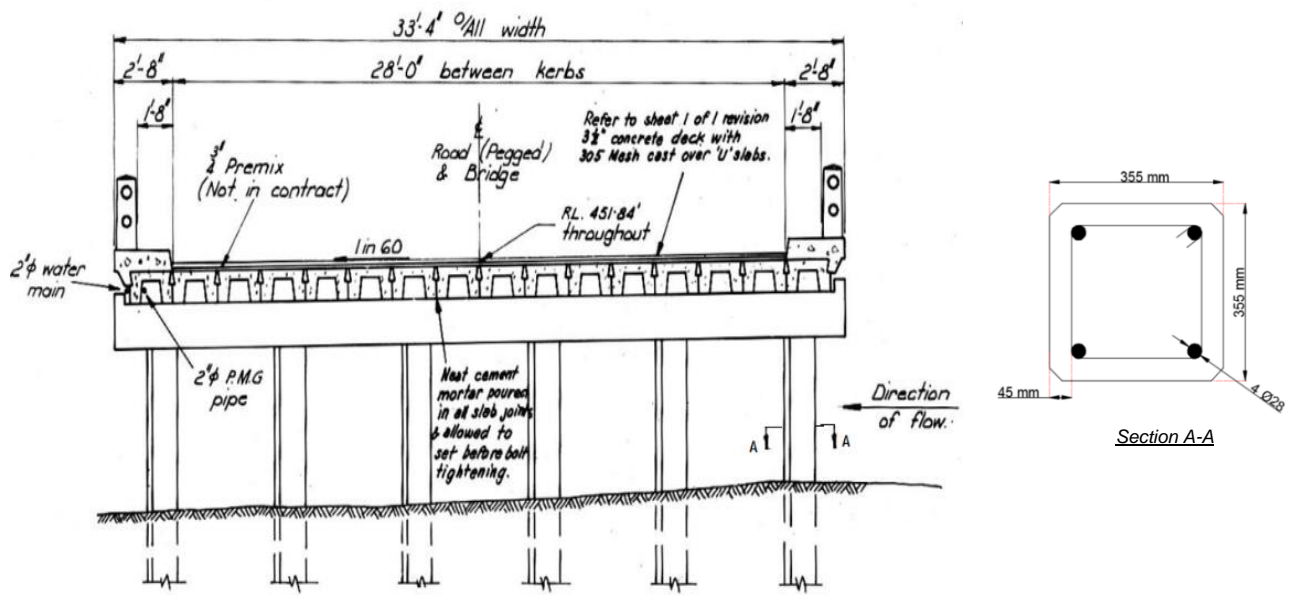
The typical case study of a U-slab bridge and the pier cross-section
